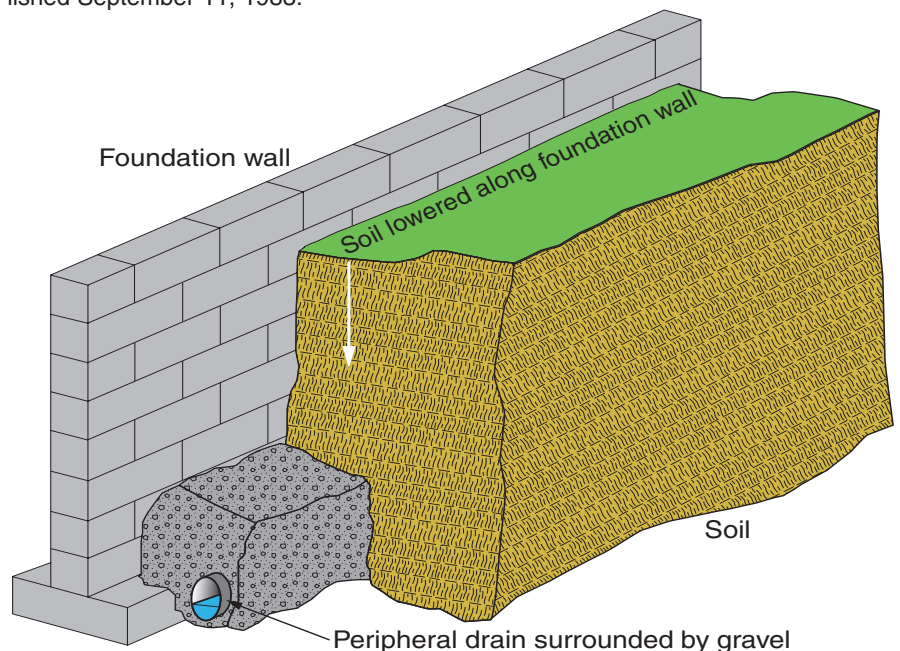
Diagram of a peripheral drainage system around some exterior foundation walls. Over time, the drainage system removes small amounts of soil and lowers the ground surface along the foundation.
